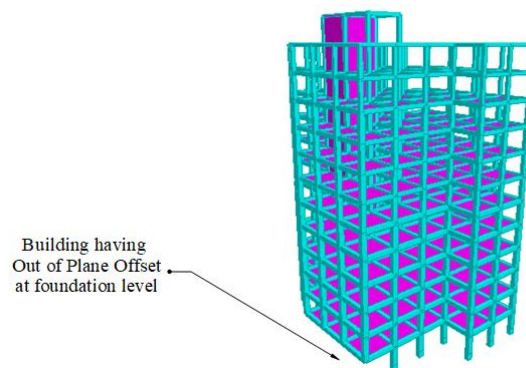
Model Possibility 1 - General Structure with out of plane offset provided at foundation level
